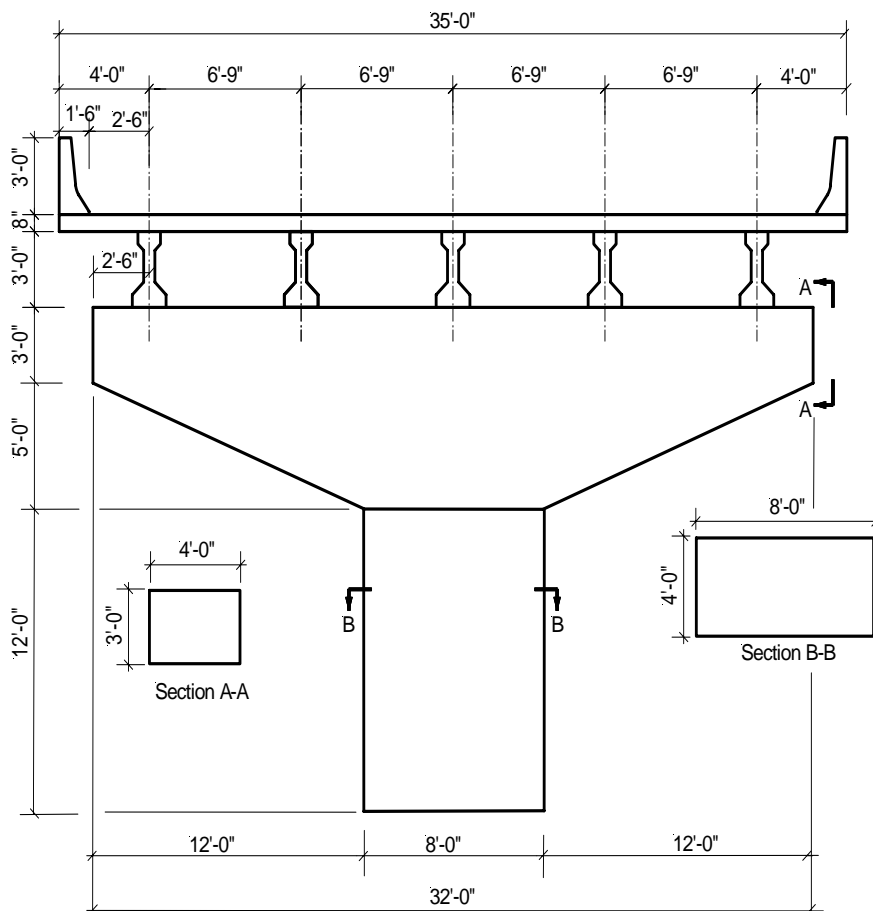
Hammerhead Bridge Cross Section at the Pier
